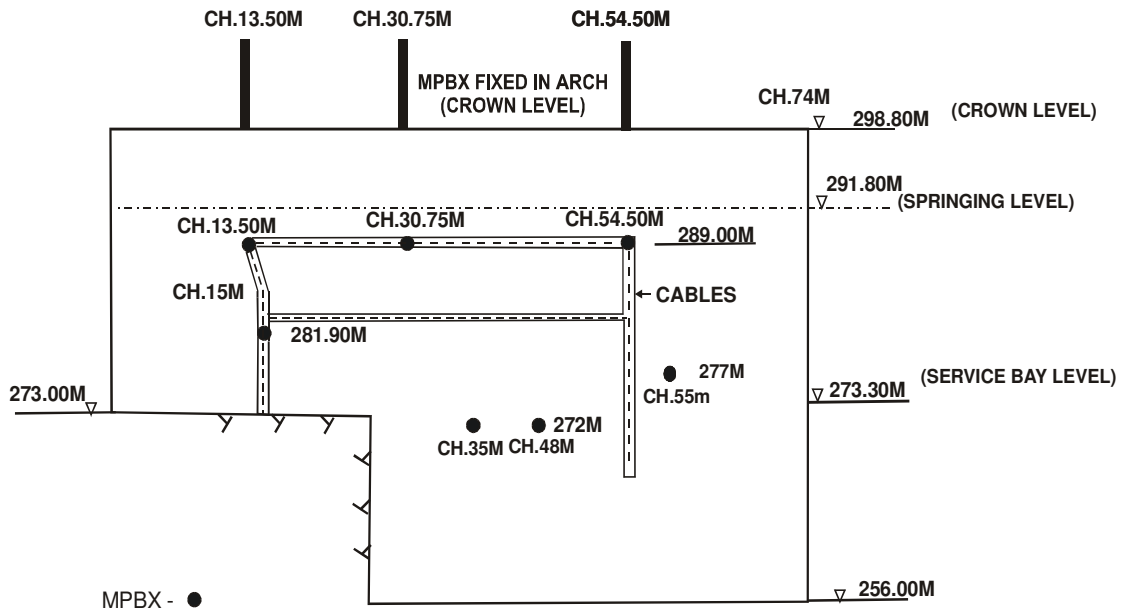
L-section of Machine hall showing downstream wall with instrument locations and cable layout
